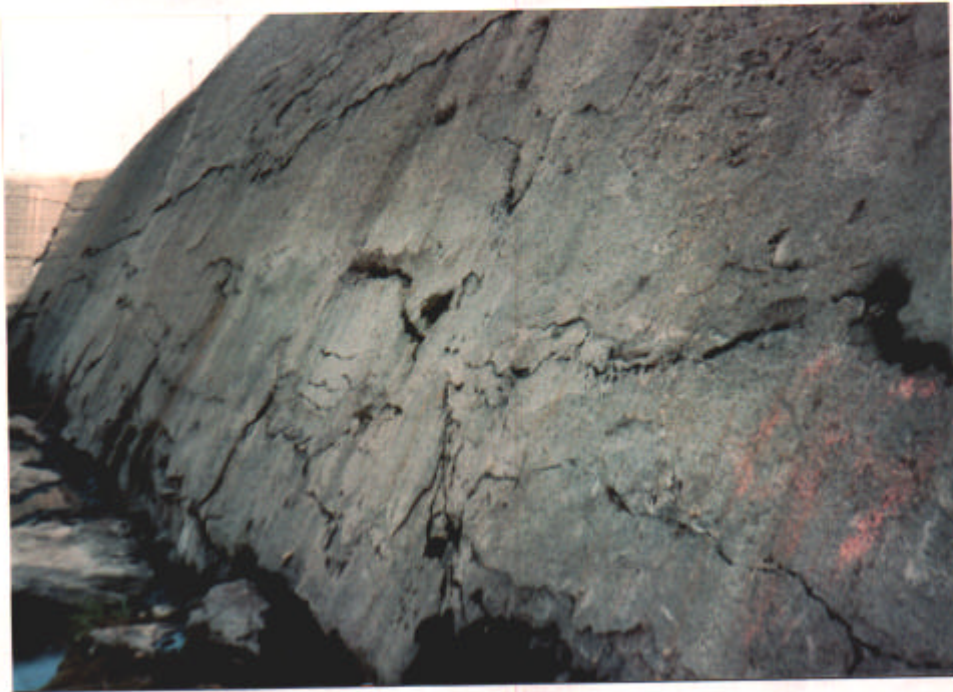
TYPICAL CRACKING ON DOWNSTREAM FACE OF DAM
